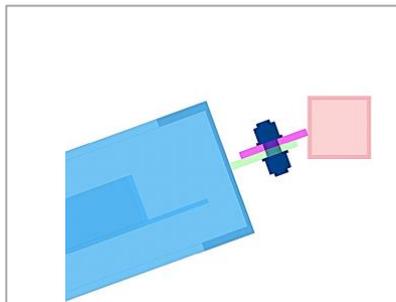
Typical standard SHS/RHS post connection to truss PFC end vertical (with direction change)
